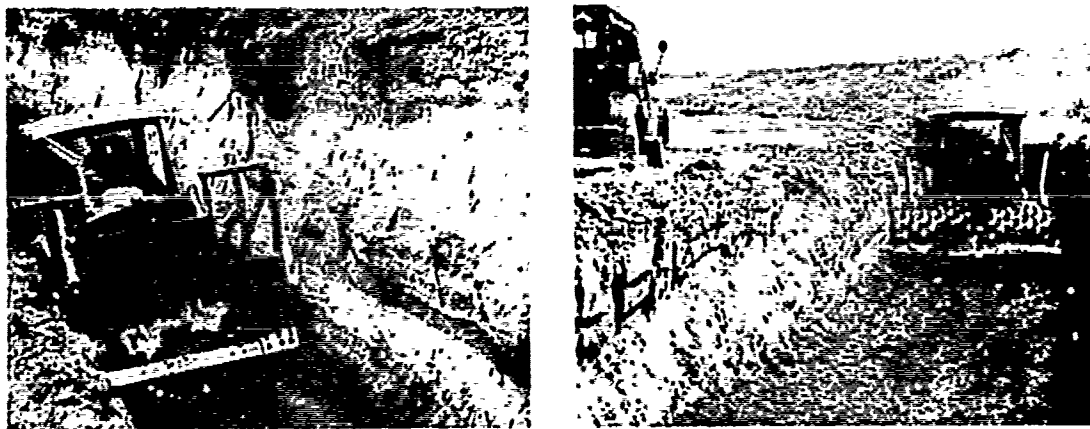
Construction of cutoff through shallow sand stratum beneath levee
